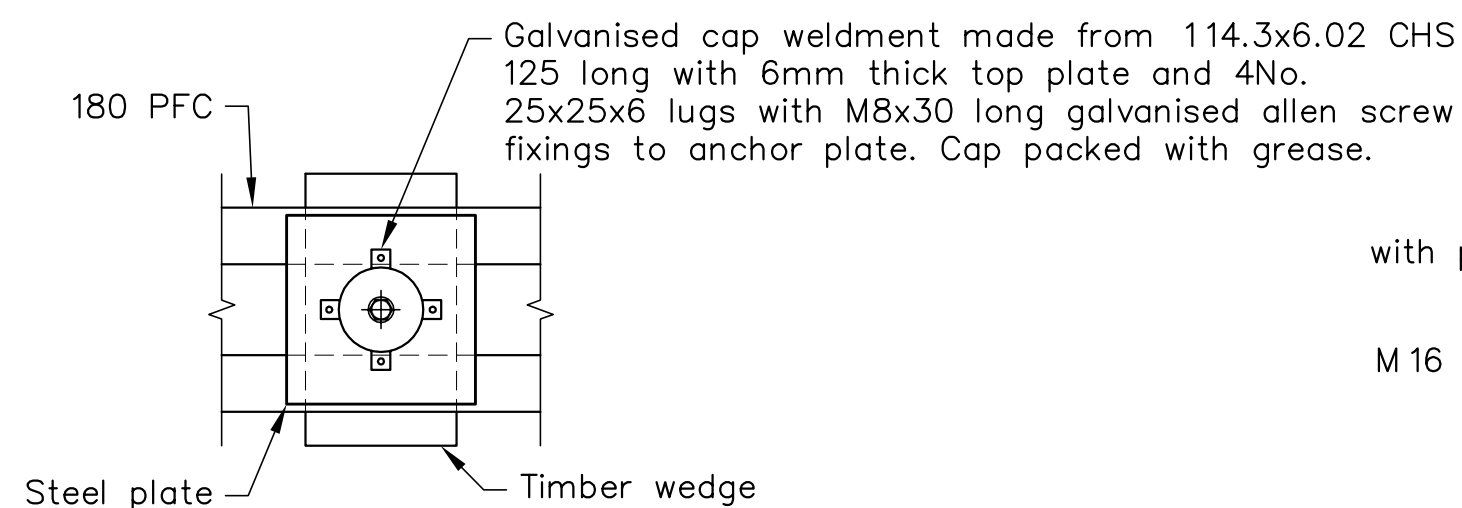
DETAIL A PLAN - TYPICAL BACK-TO-BACK PFC WALER
